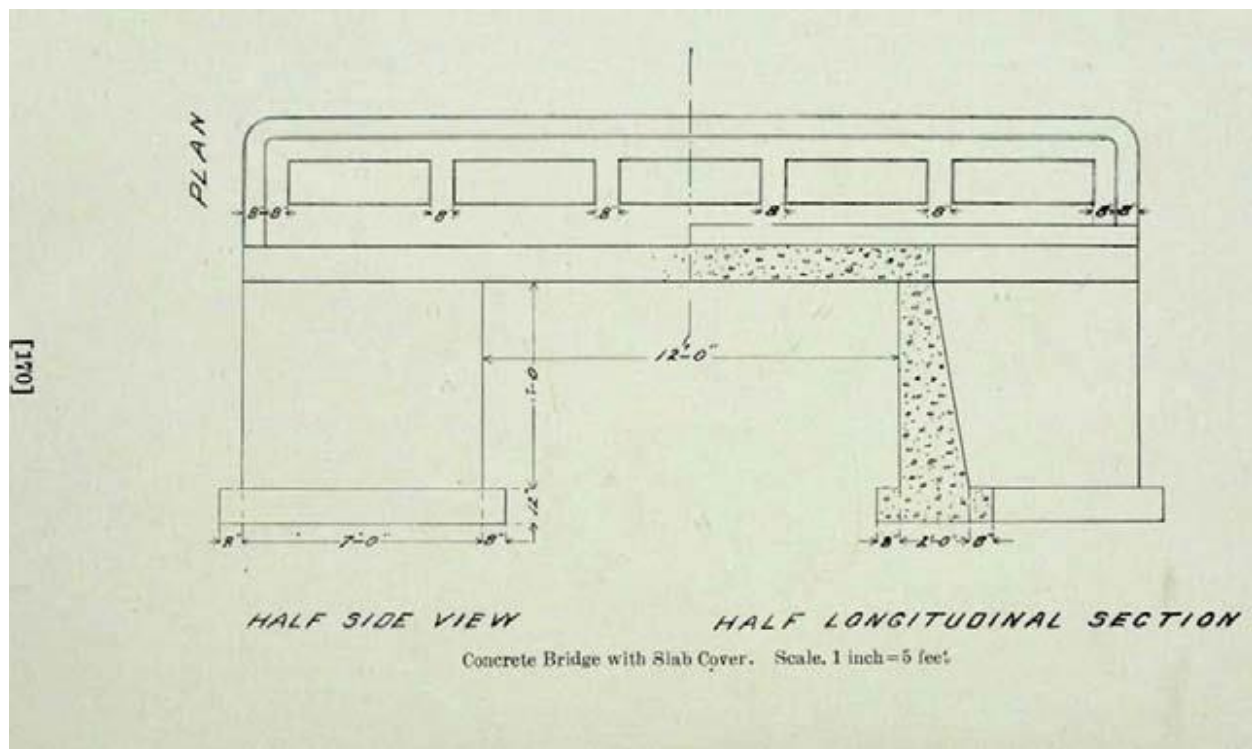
Half longitudinal section of a typical concrete bridge design with slab cover [Annual Report on Highway Improvement Ontario for 1910, No. 14, 170].
